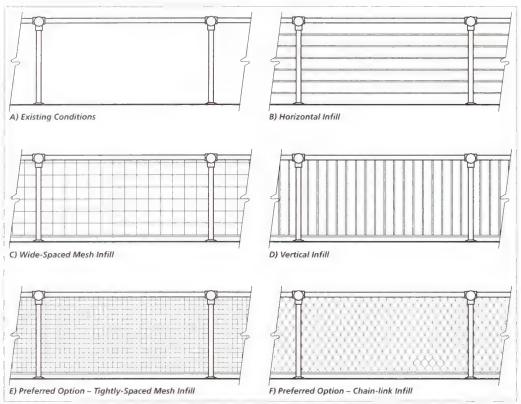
Safety railing infill elevations. Horizontal members and wide-spaced meshes (options B and C) create a ladder effect that potentially encourages climbing. Adding vertical members (option D) creates a balustrade appearance that detracts from the historic form of the simple pipe rail guards. The preferred option (E or F) for visitor safety and to retain the historic form is to add tightly-spaced mesh panels (Olmsted Center, 2009).
